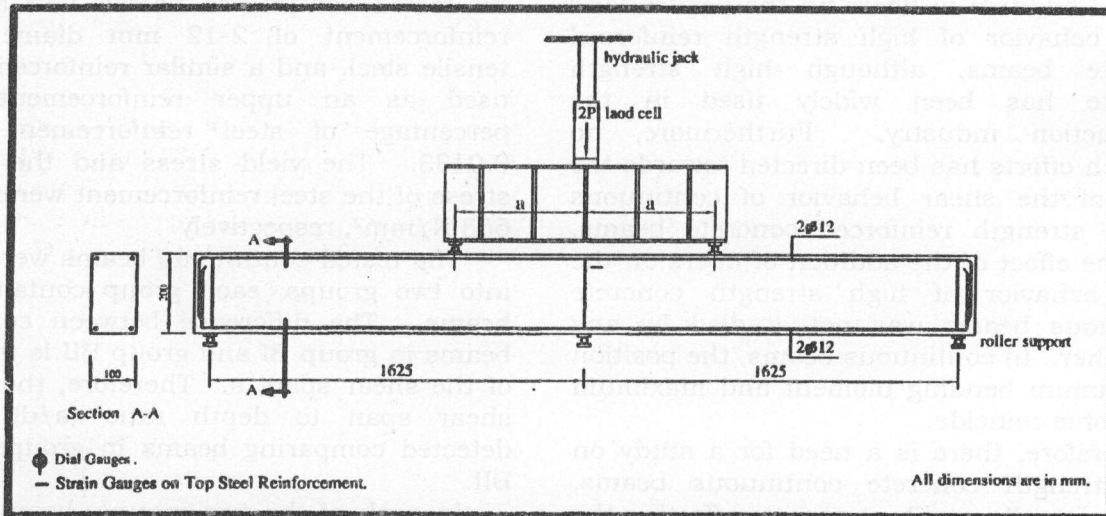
Dimensions, reinforcement details, and loading setup for tested continuous beams.
